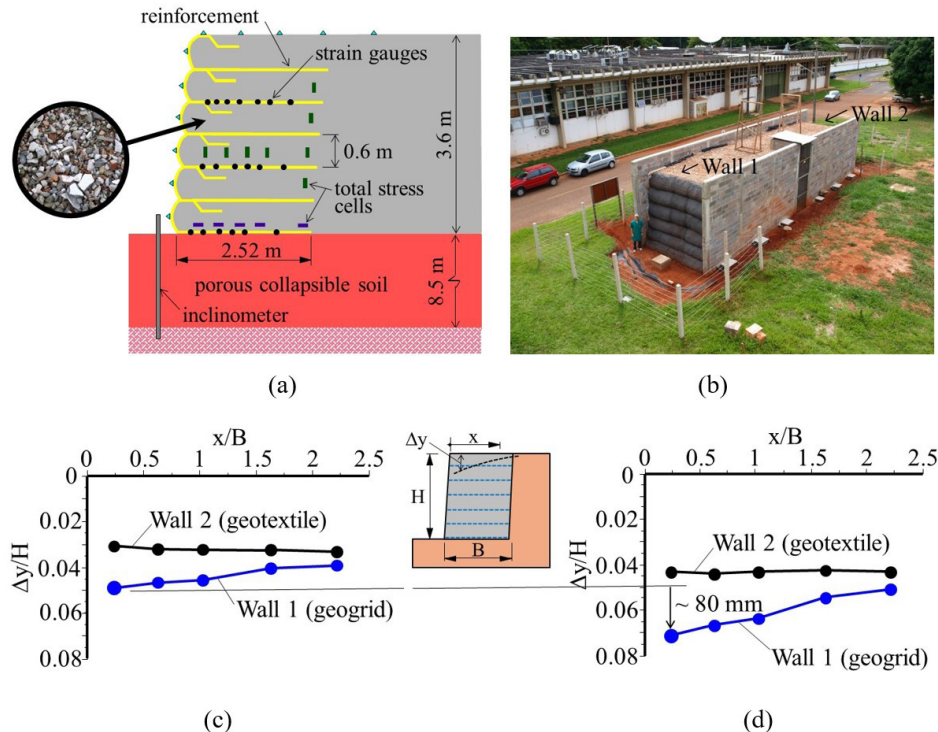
Geosynthetic reinforced walls built with RCD backfill (Santos, 2011): (a) geometrical characteristics and instrumentation of the walls; (b) walls at the end of construction; (c) settlement profile of the wall top 1 year after construction; (d) settlement profile of the wall top after subsoil inundation.
